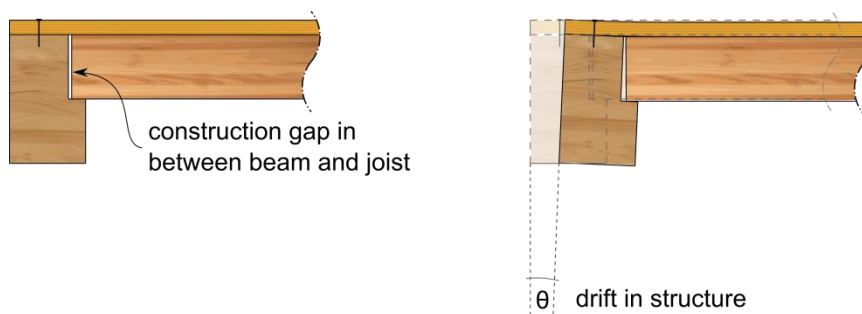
Construction gap between a timber floor and supporting beam to allow for rotation undeformed state (left) and deformed state (right)
